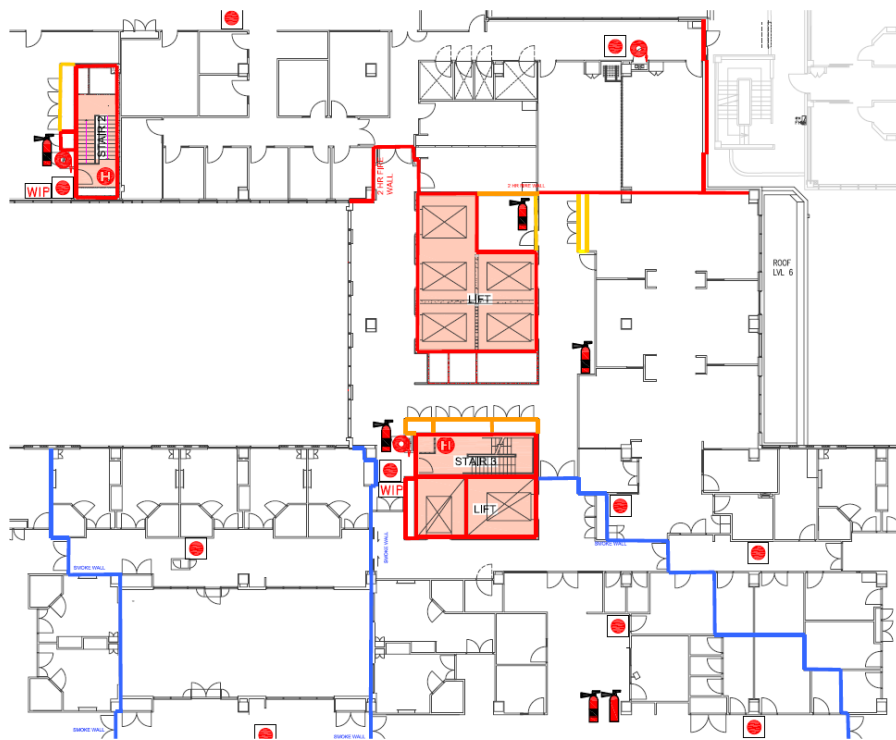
Example plan indicating location and FRL of fire-resistant building elements
